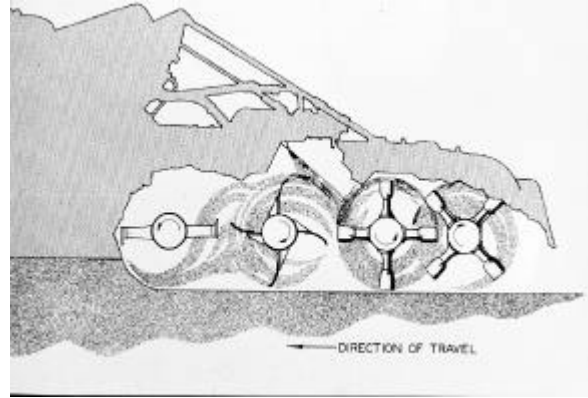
Large pulverizing machine for pavement removal and sizing.
